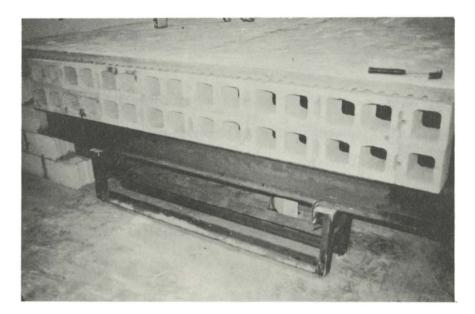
Moveable End Wall Section in Position at Extreme End of Floor for Test.
